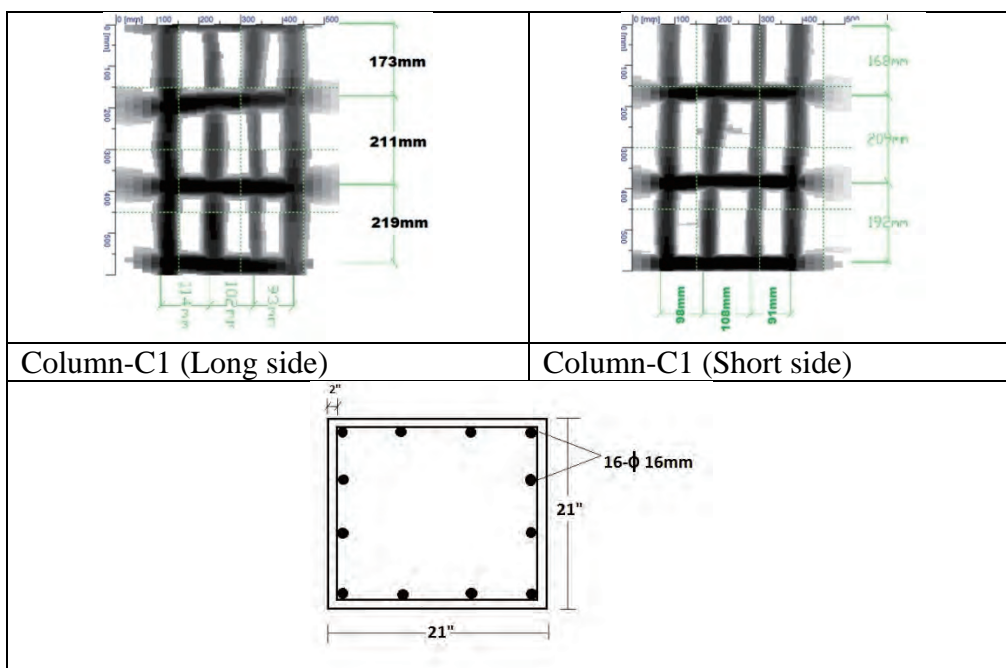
Cross section (in built) of column C1 (marked at figure 2)
